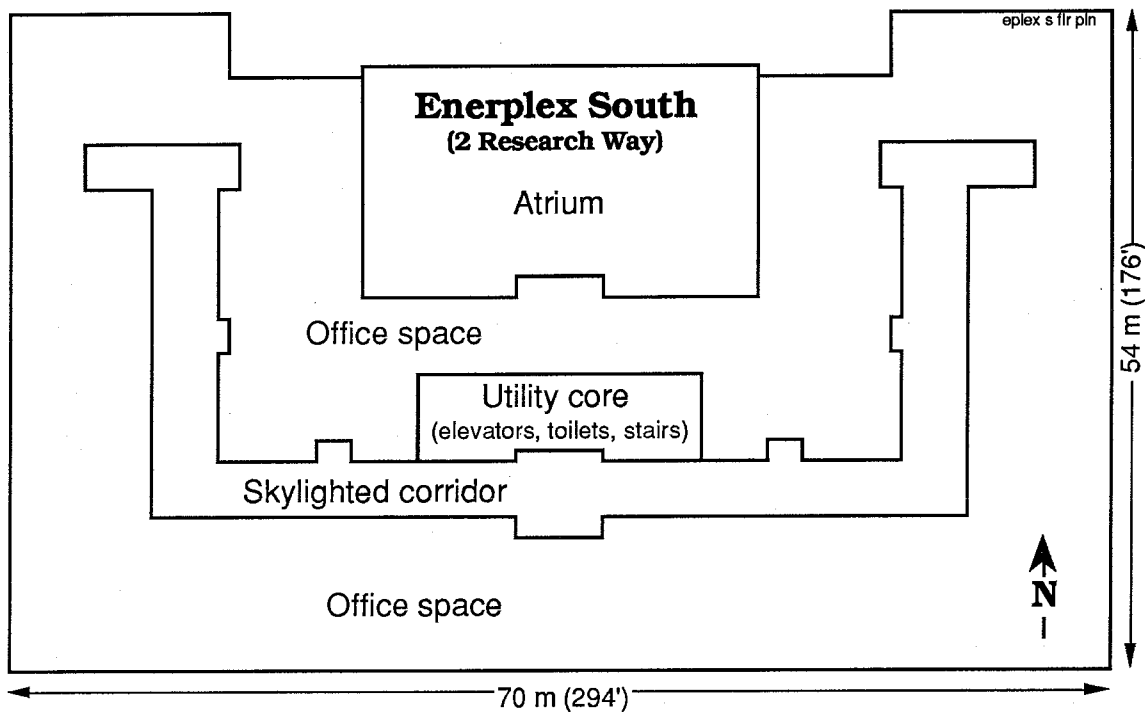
Floor plan of the study building (floors one through three similar). The skylighted corridor is open from floor to roof. The atrium, enclosed in glass, is not heated or cooled.
